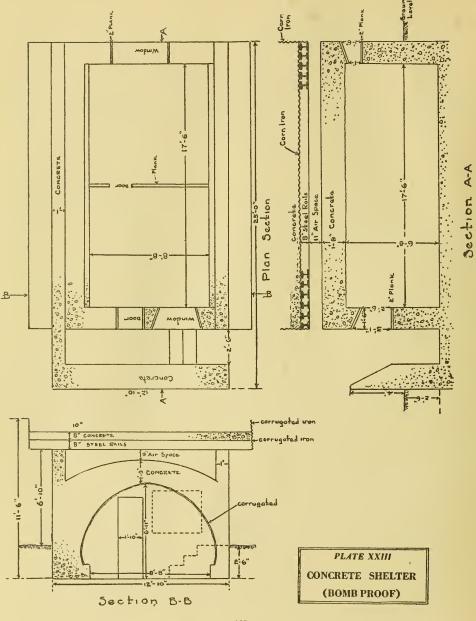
Plate XXII shows an arched top with sandbagging over it, while Plate XXIII shows a very different construction. The side walls in XXIII are built up straight and a burster course built above an air space. This is believed to be much better form of construction that
